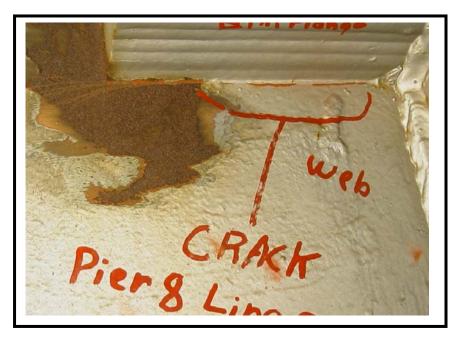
16-4: Crack Identified by Magnetic Particle Testing
